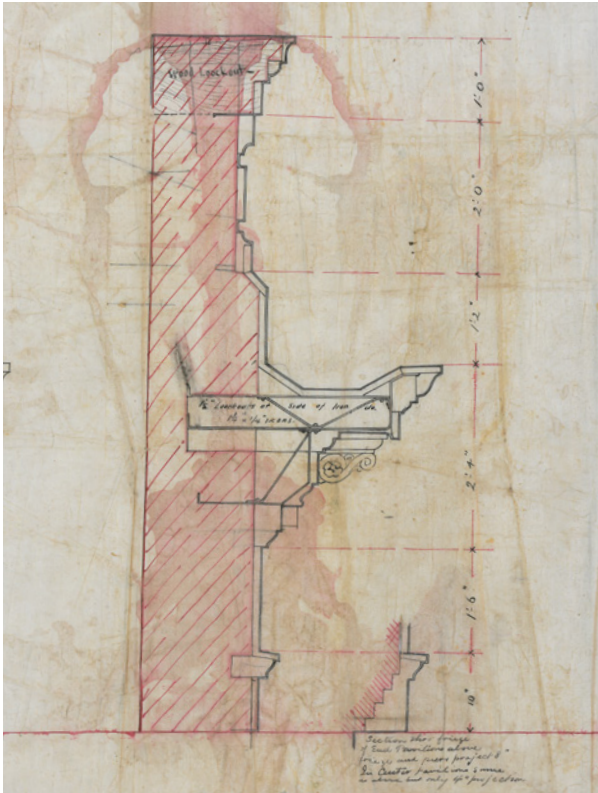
Original Phase I - 1888 Gibbs Drawing, Indicating the Galvanized Sheet Metal and Armature Detail for the Cornice And Parapet Walls.
